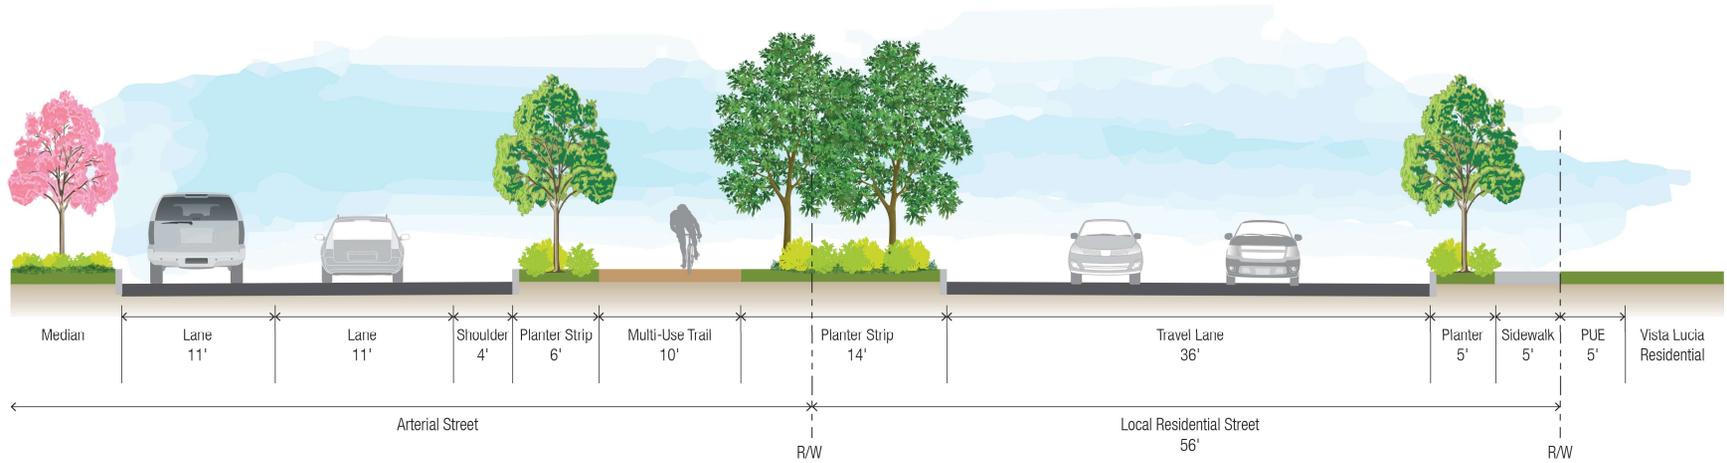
4-Lane Arterial Alternate Section—Showing a Fronting Local Residential Street--Fanoe Road north to Rhone Way, Looking North (See Figure 3-14: Fronting Local Roadway Preliminary Concept--Fanoe Road, north of Burgundy Way)
